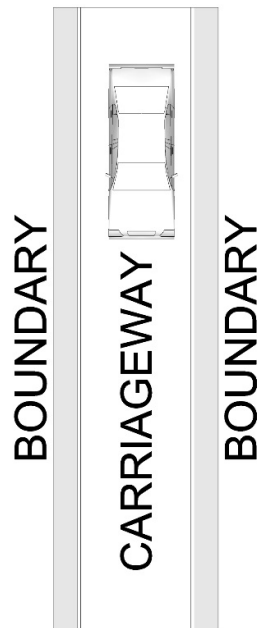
Suburban, live and play, access to houses/townhouses (1 to 3 du, or 1 to 6 du)
